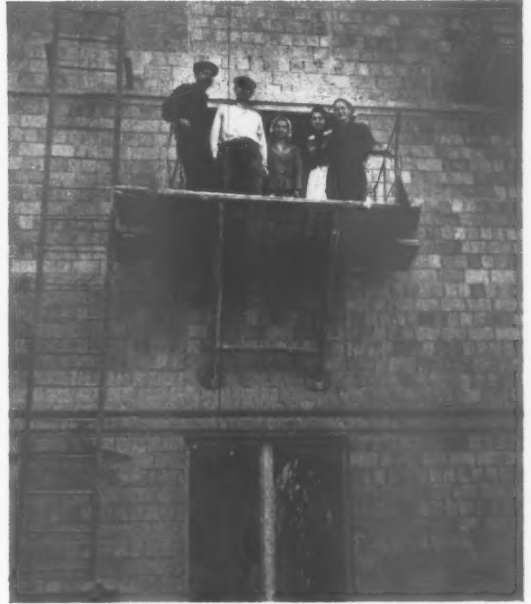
A typical bracket scaffold (see also page 514). Ordinary scaffolding seems to be hardly used at all, at least during the constructional stages of building.
